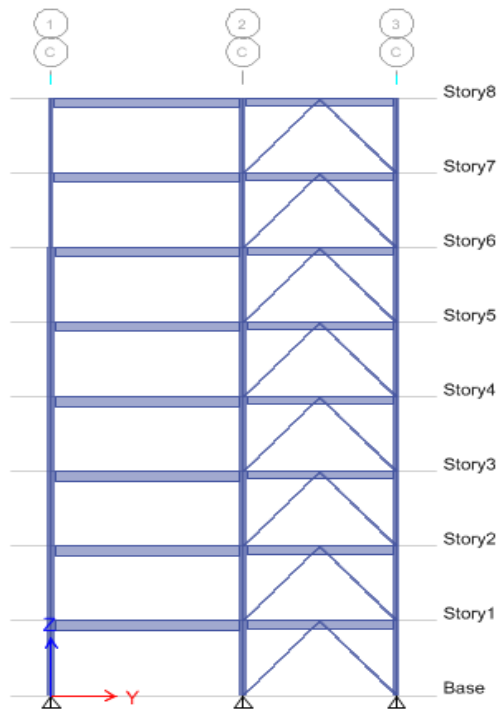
Typical I-beam and bracing elevation of the dormitory building (IR8F-I) in y-direction.
